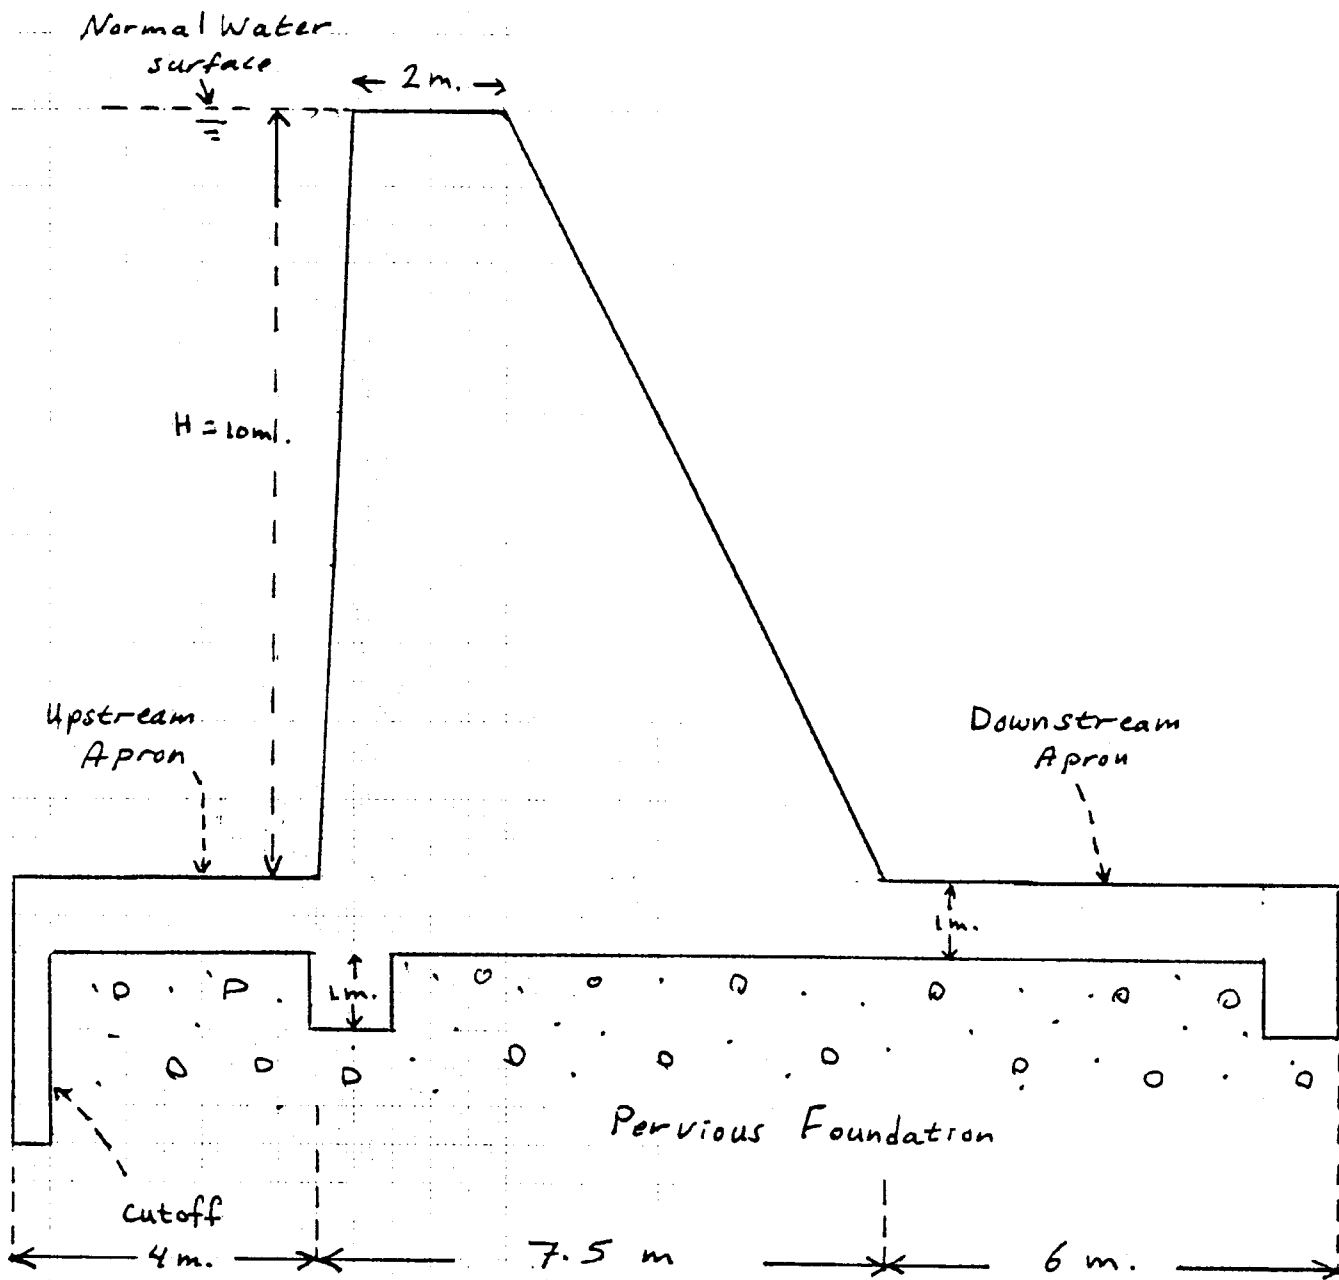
CROSS SECTION FOR THE PROPOSED DAM
